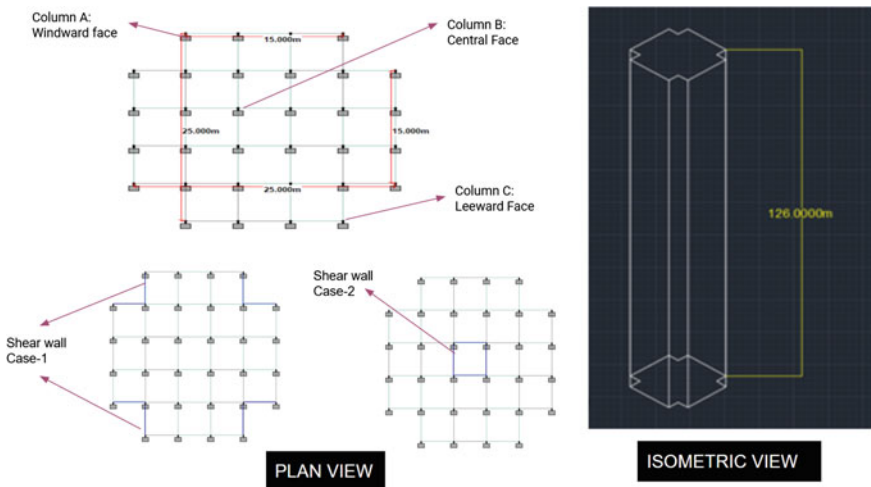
Plan view of building, shear wall case-1, shear wall case-2, and isometric view of square-shaped building with triangular edges
